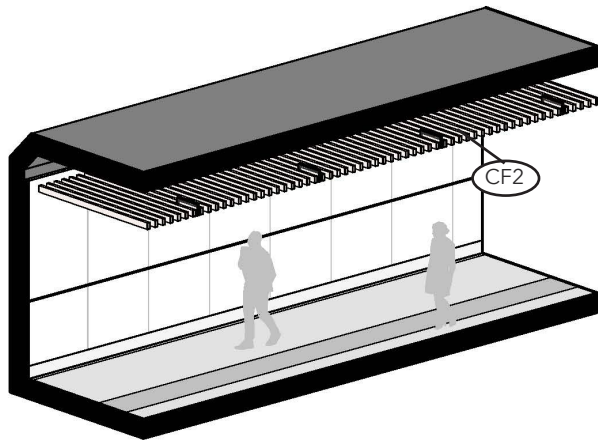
Illustration of tunnel showing ceiling raceway and wall finish
